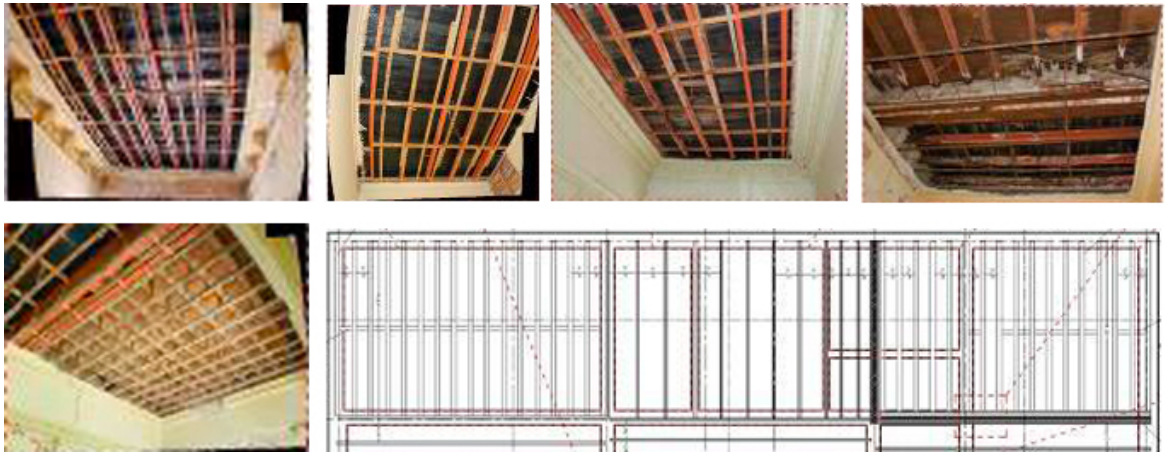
different examples of wooden structure ceiling from a similar style building erected during the same period after (Khalil et al., 2018)
